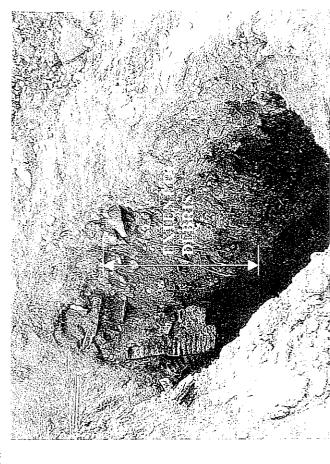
Last Day of Loading Contaminated Soil from Planned Excavation for Transport to CAMU (August 27, 1999)
